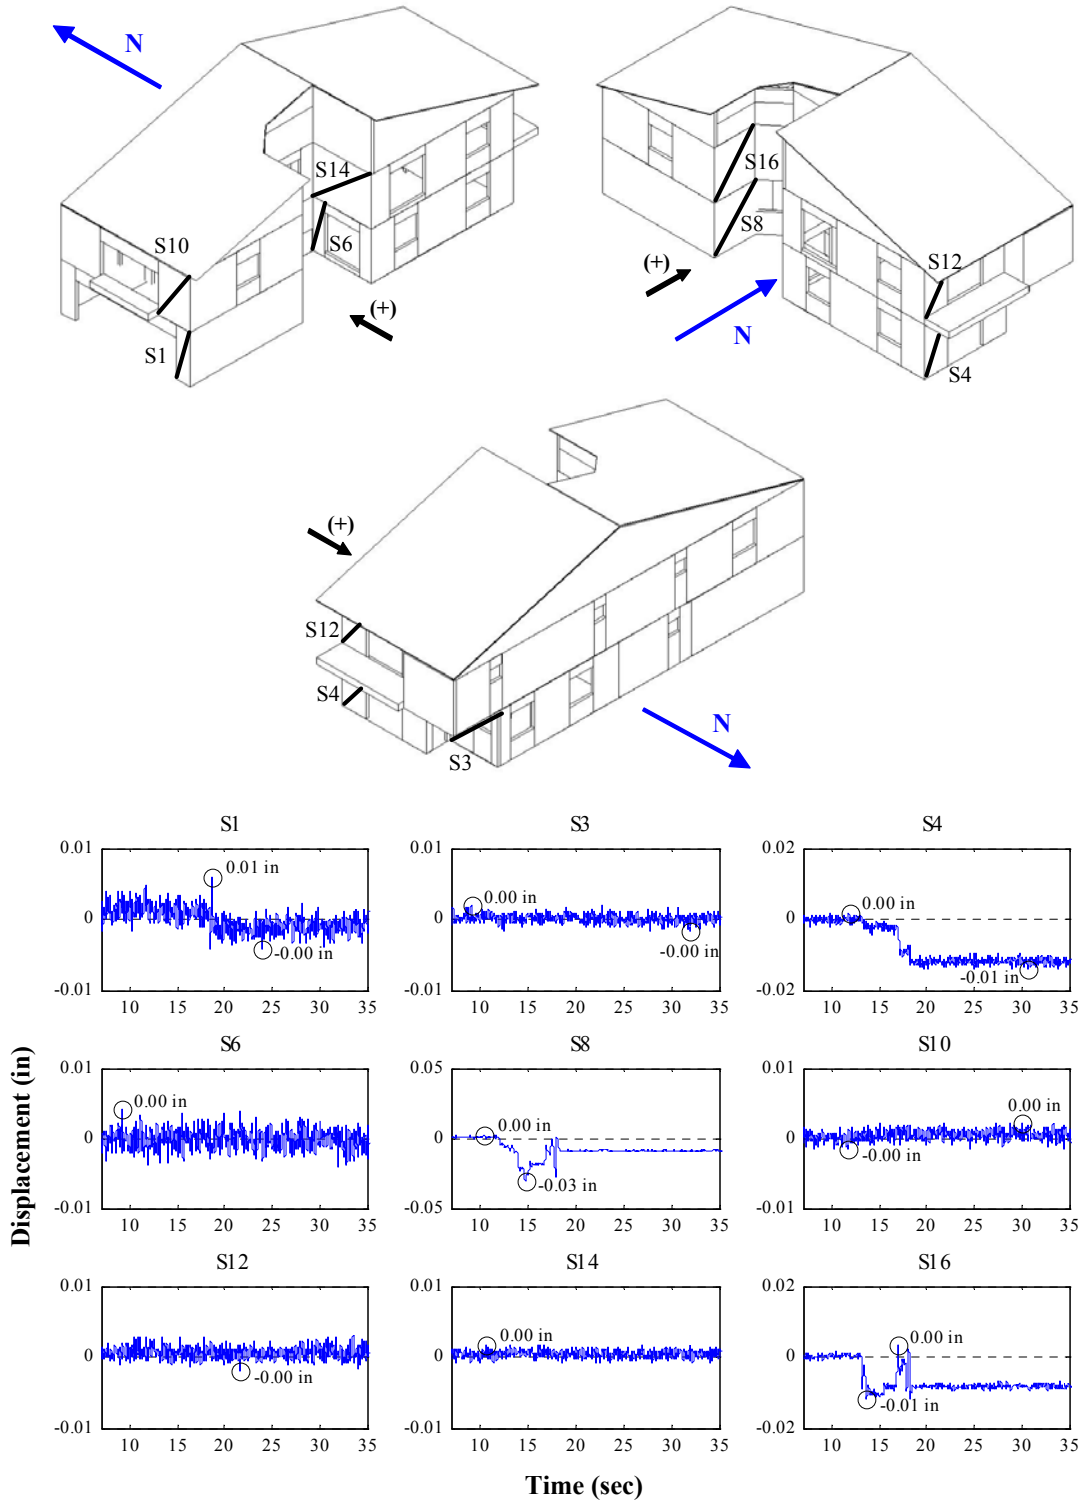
Wall deformations of north-south external walls for Test NWP2S04
